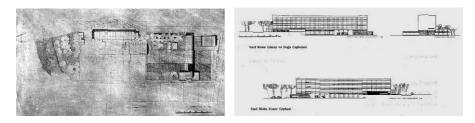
Moda College, with Behruz Çinici, 3rd Prize, 1957, site plan, south and north elevations of the classrooms block.
